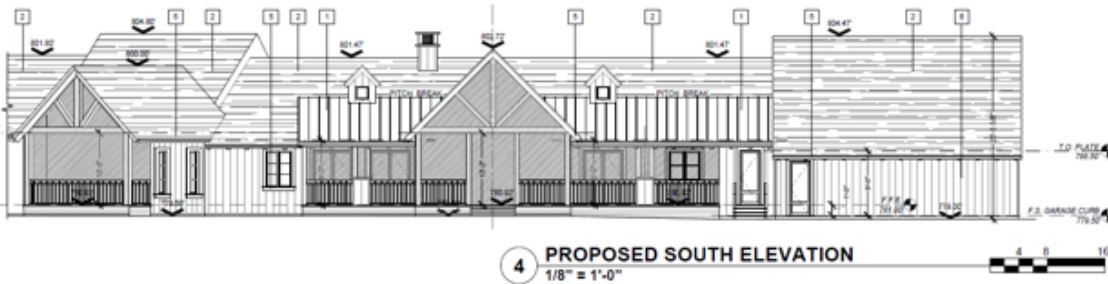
PROPOSED ACCESSORY DWELLING UNIT ELEVATION
